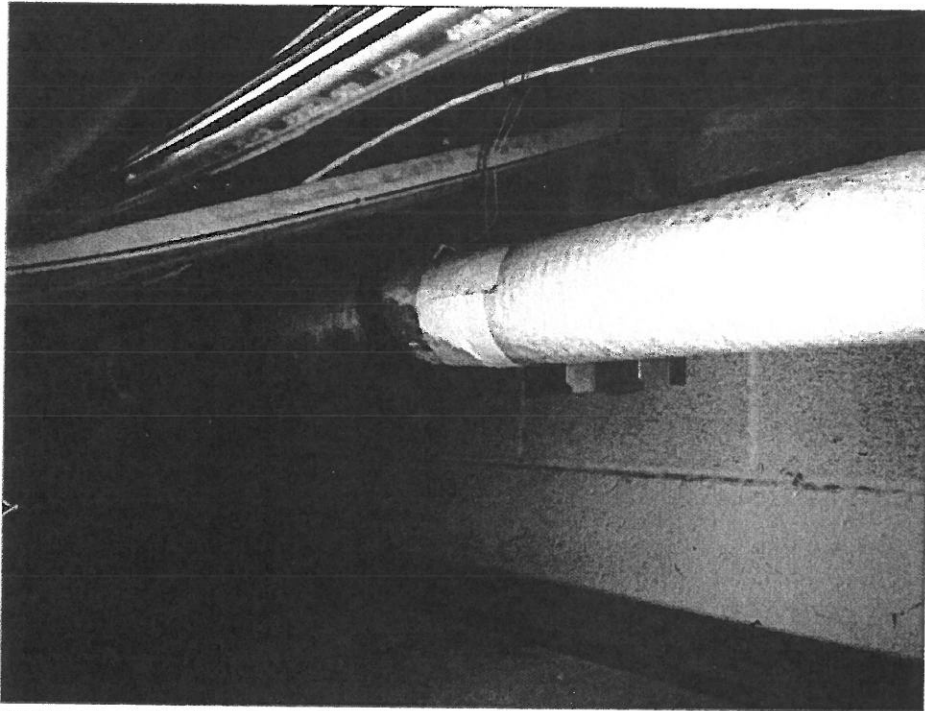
Pipe insulation above ceiling in room 26 on August 30, 2013.
